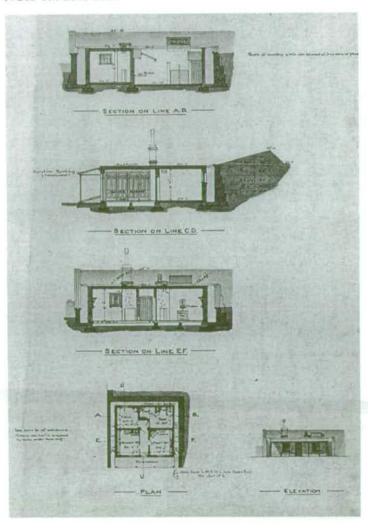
Plan dated 1890 of the guard house (PRO: WO 78/5141/7) The guard house, built in 1890 (PRO: 78/5141/3), later served as the Master Gunner's house and an officer's mess.
